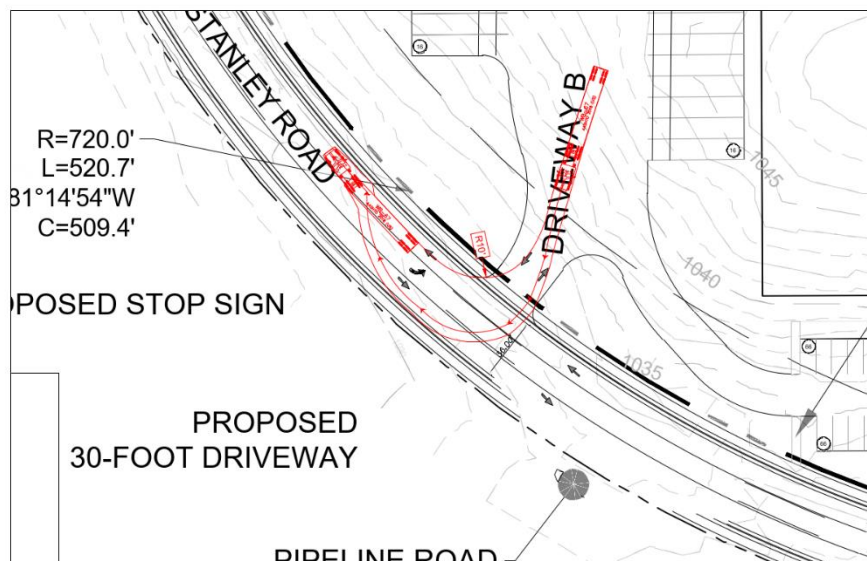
Stanley Road at Driveway B – Westbound Right (Exiting Truck)
